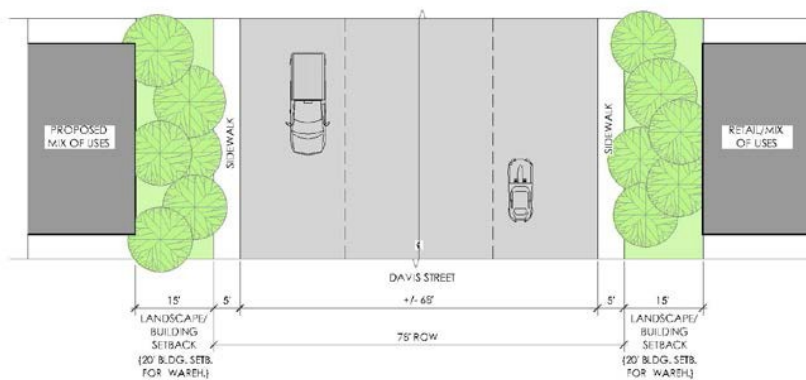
Hemlock Avenue and Davis Street Plan B
